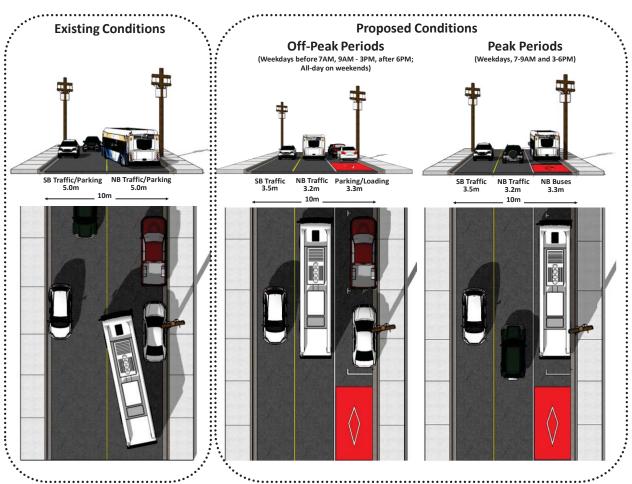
Existing and proposed typical cross section (looking to the north) - Gottingen Street
